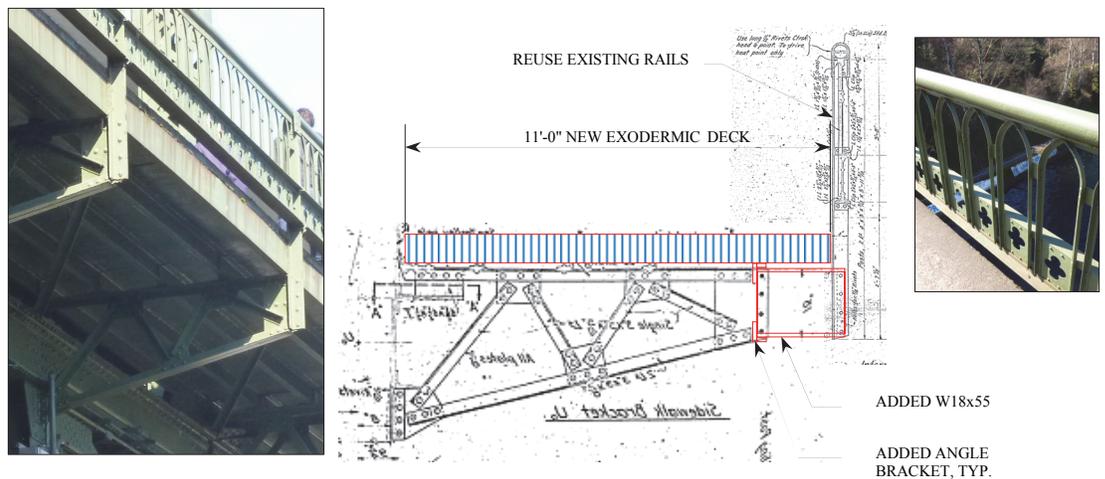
Existing and Revised Bascule Bridge Walkway
